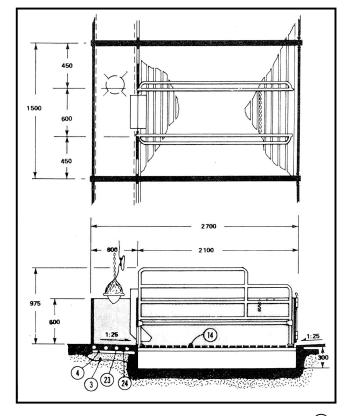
Front-creep farrowing pen with totally-slotted floor 14. Use either strip floor heating 23, or suspended radiant heating. 3 sand fill compacted flat. 4 50 mm extruded polystyrene insulation board.
